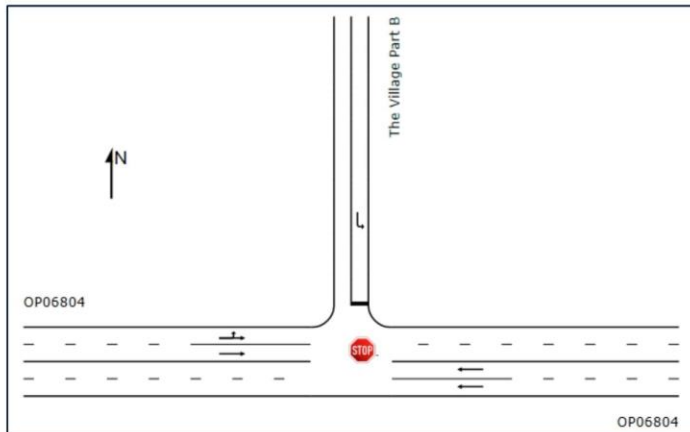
OP06804 and Planned New Development Access: The Vintage Part B Proposed Intersection
